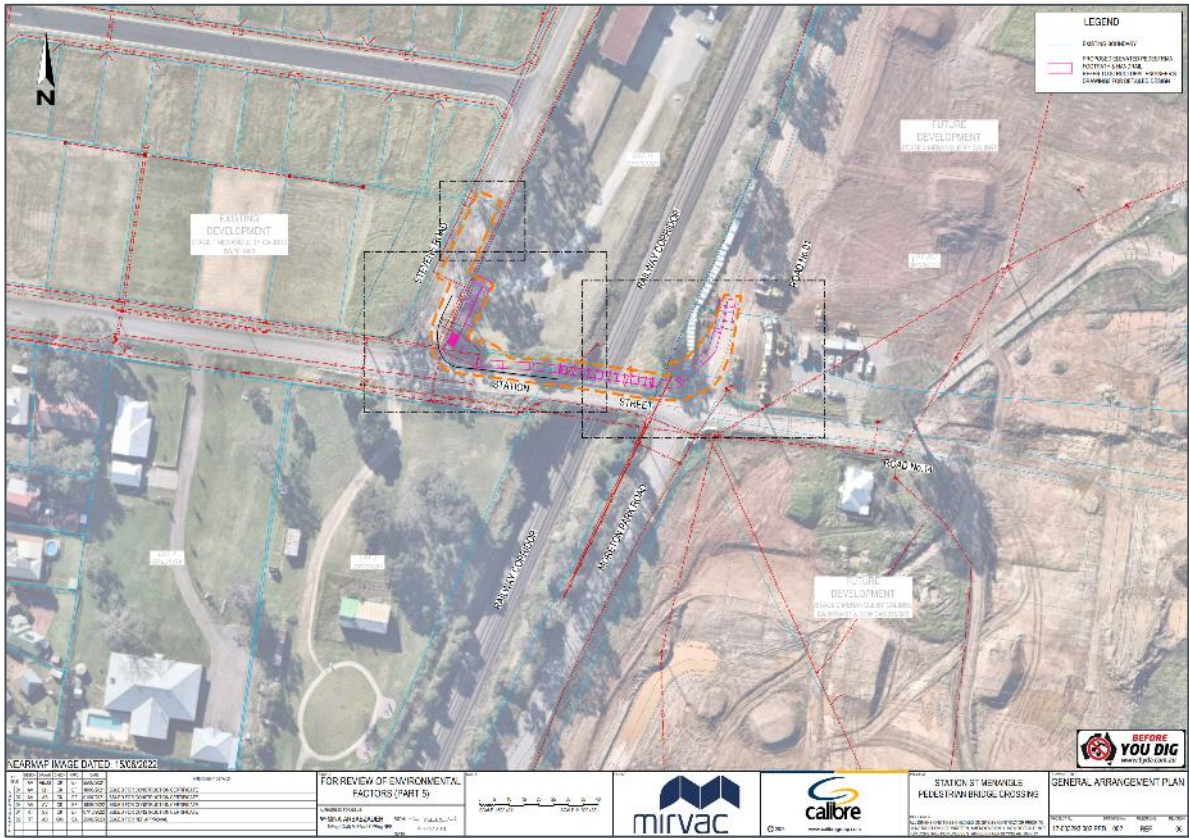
General arrangement of the proposed pedestrian bridge (source: Egis, 2022)
